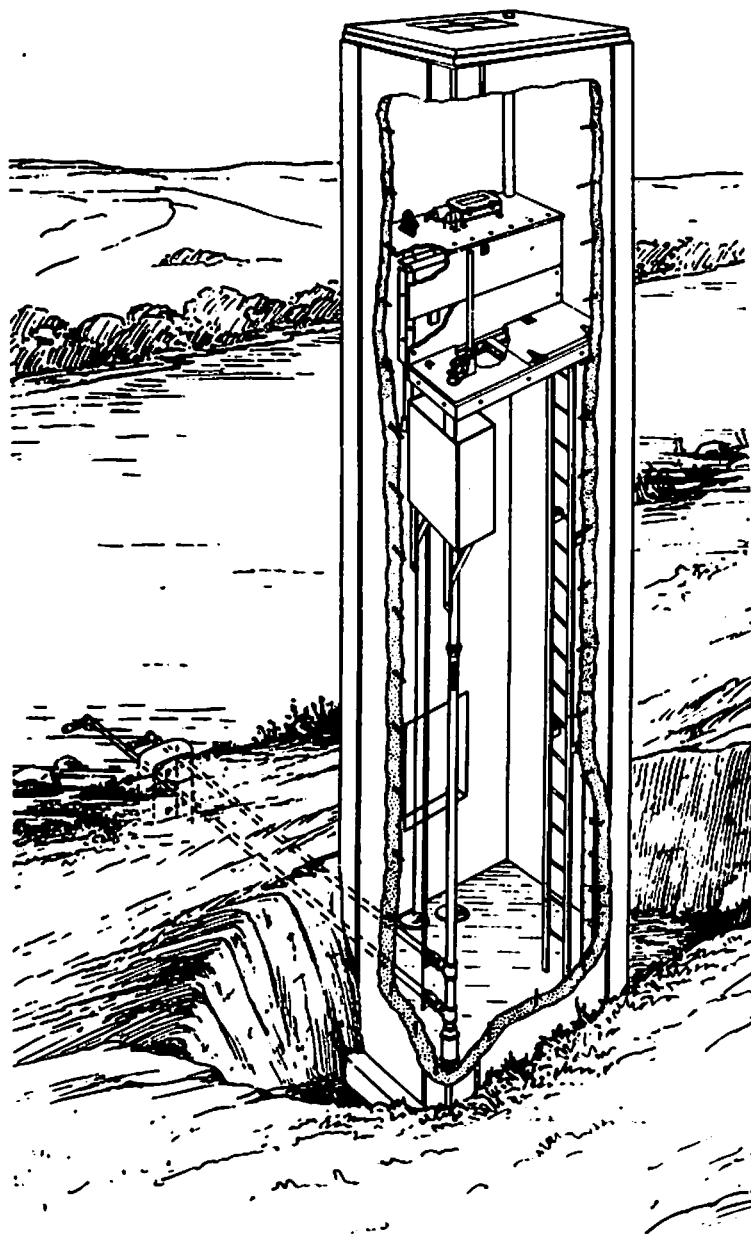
Typical design of river-measurement station showing reinforced concrete well and house for water-stage recorder.
